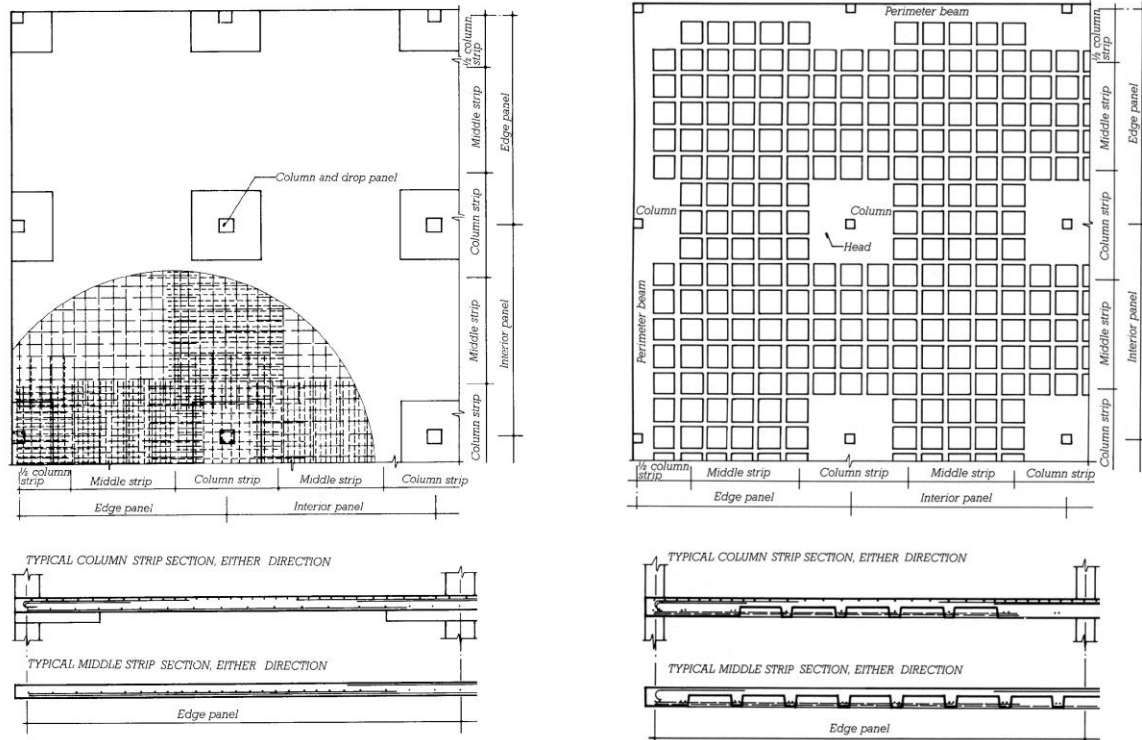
Plan and section view of a two-way flat slab with drop panels system (left) and a two-way waffle slab system (right). © 2004 John Wiley and Son, Inc.
